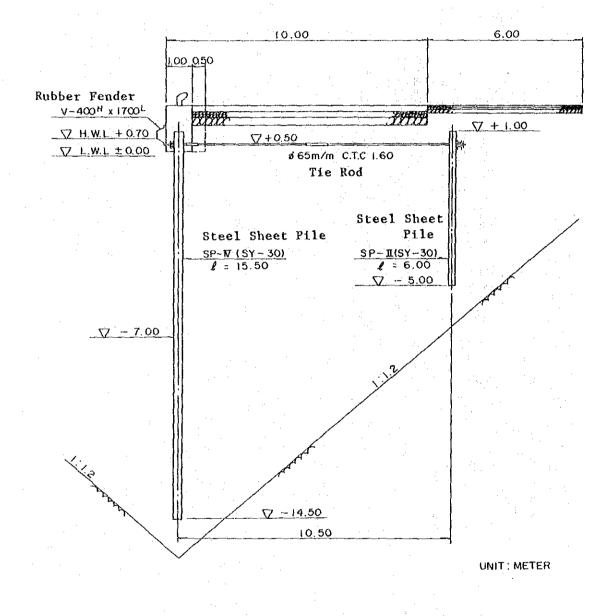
Typical Cross Section of New Landing Quay
